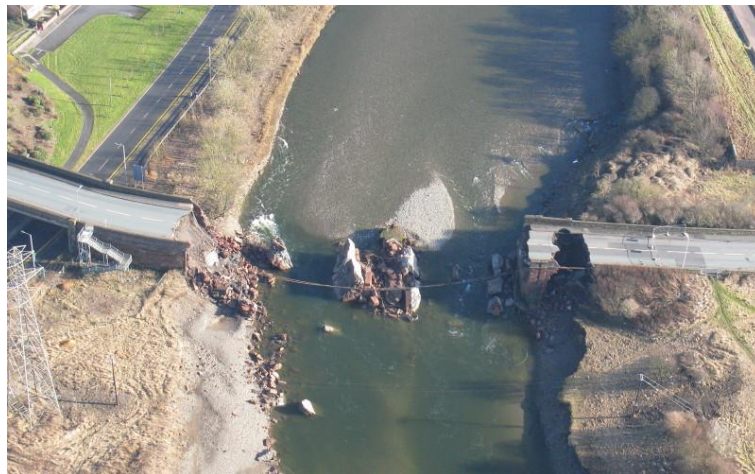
Northside bridge collapse (Photo credit: Simon Ledingham).
